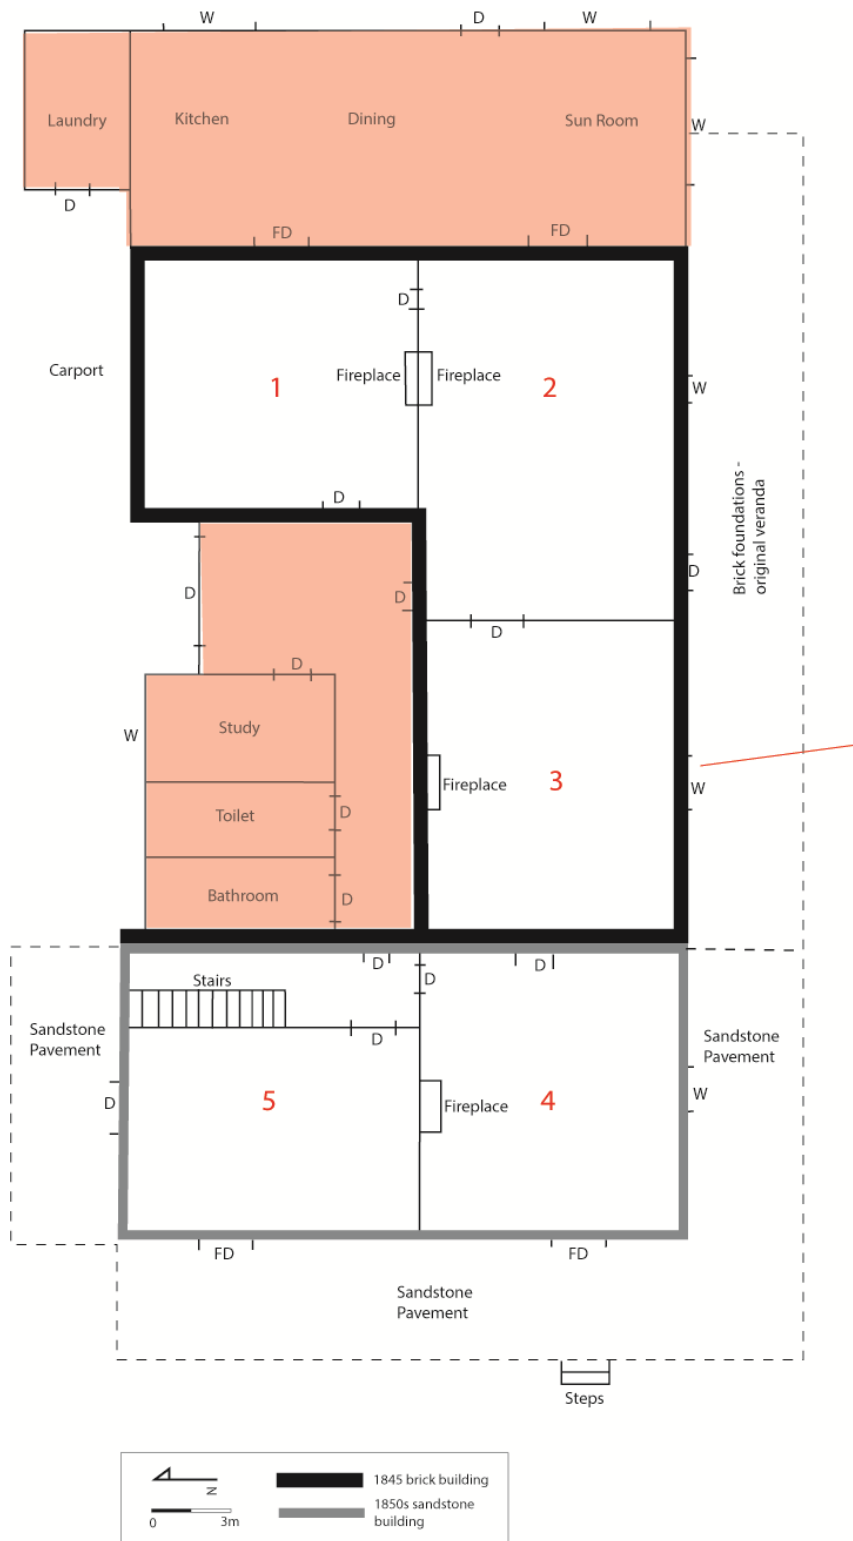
Plan of Negoa showing the modern northern and eastern additions that are intrusive and can be retained or, preferably, removed when resources allow subject to an assessment of heritage impact.
